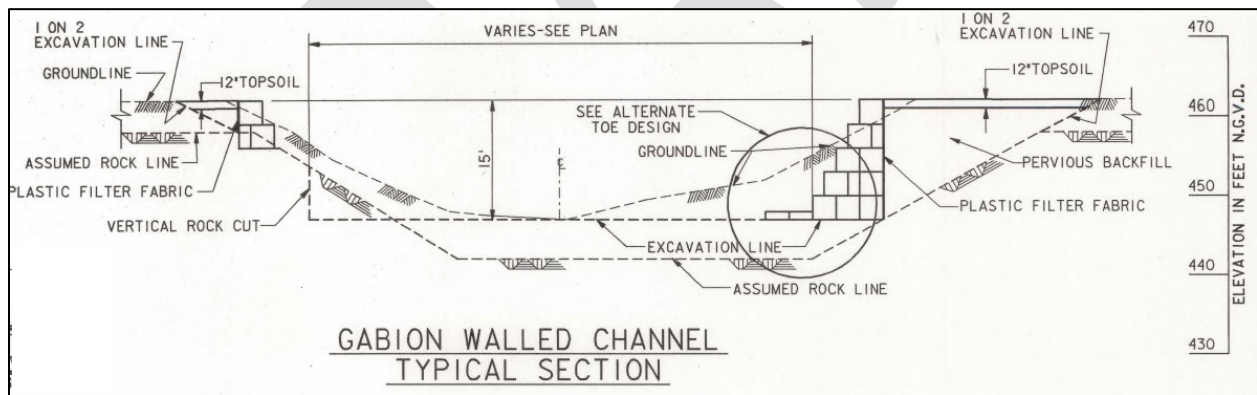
Gabion walled channel cross section (channel modification) from 1988 Feasibility Study.
